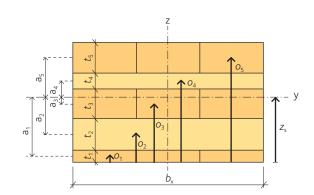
Structure and numbering of a non-symmetrical cross-section.
